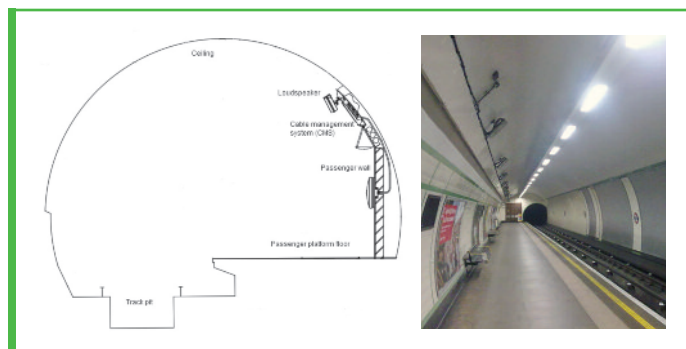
London Underground station subsurface platform cross section representation (left) and corresponding actual platform space.
